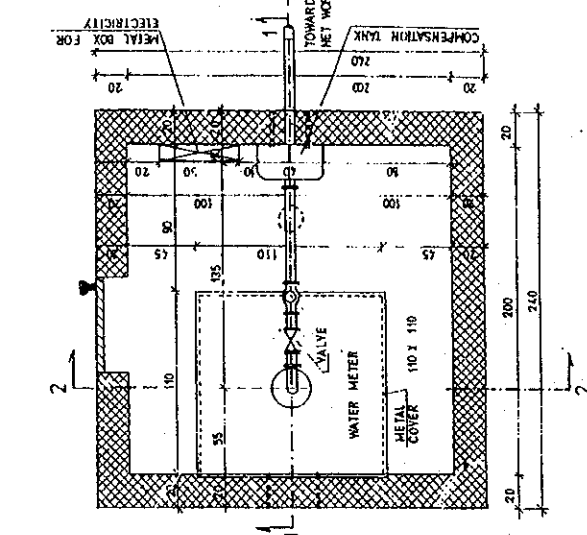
Standard Drawing of Spring Intake (Type B)
